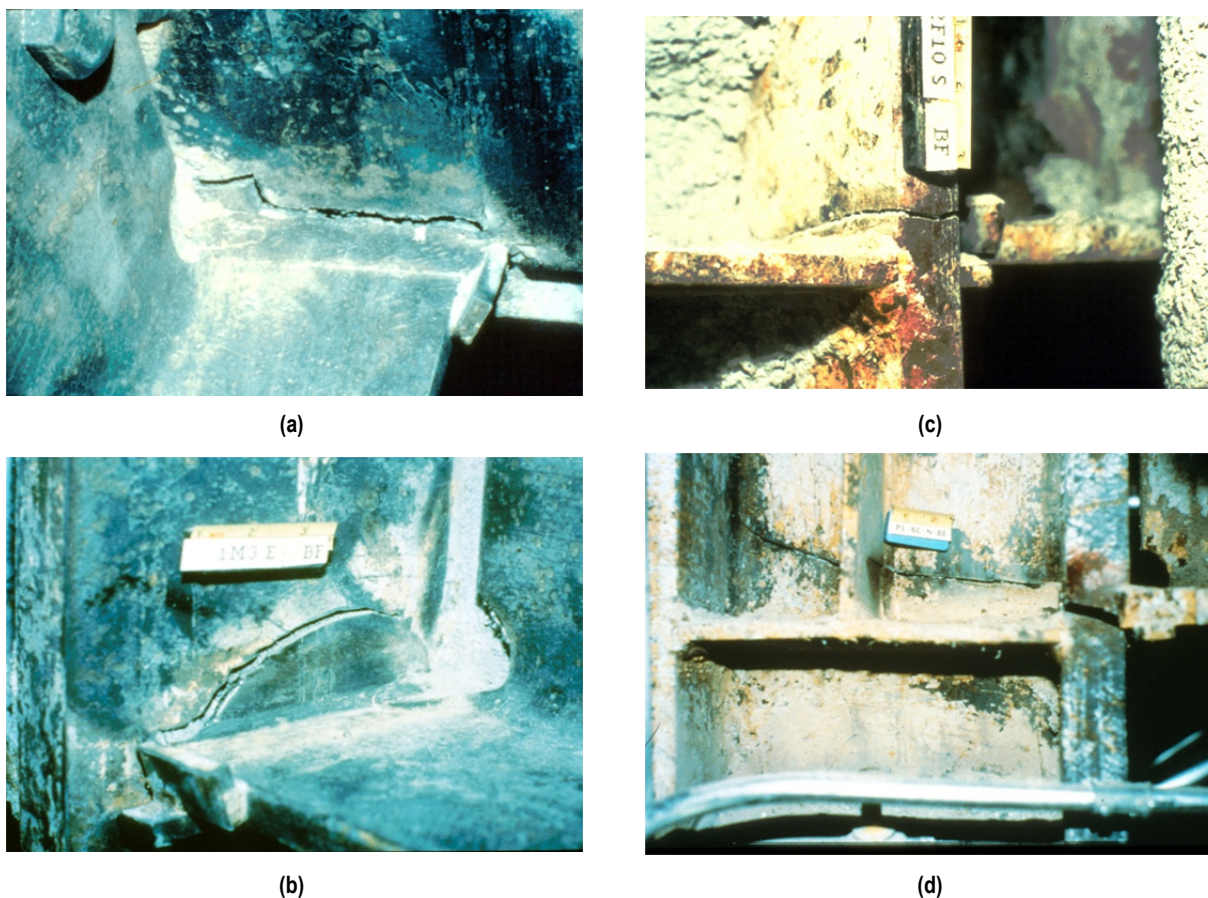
Types of connection damage in steel moment-resisting frame buildings observed after the 1994 Northridge earthquake: (a) fracture at heat-affected zone; (b) column flange fracture; (c) fracture through column flange; and (d) fracture through column flange and web (sources: AISC and FEMA-355E).
